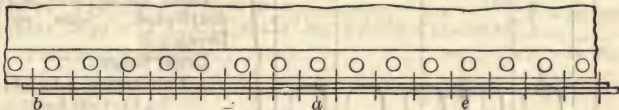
Splicing of Inner Plate of Bottom Flange of Plate Girder. Example 1
